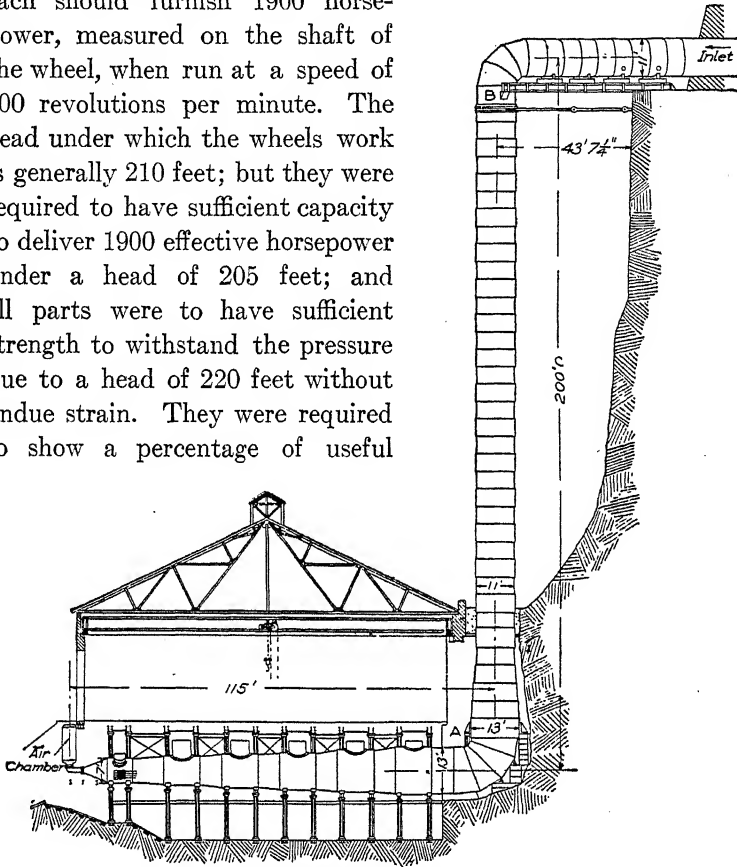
General Dimensions of Penstock of the Hydraulic Power Company
